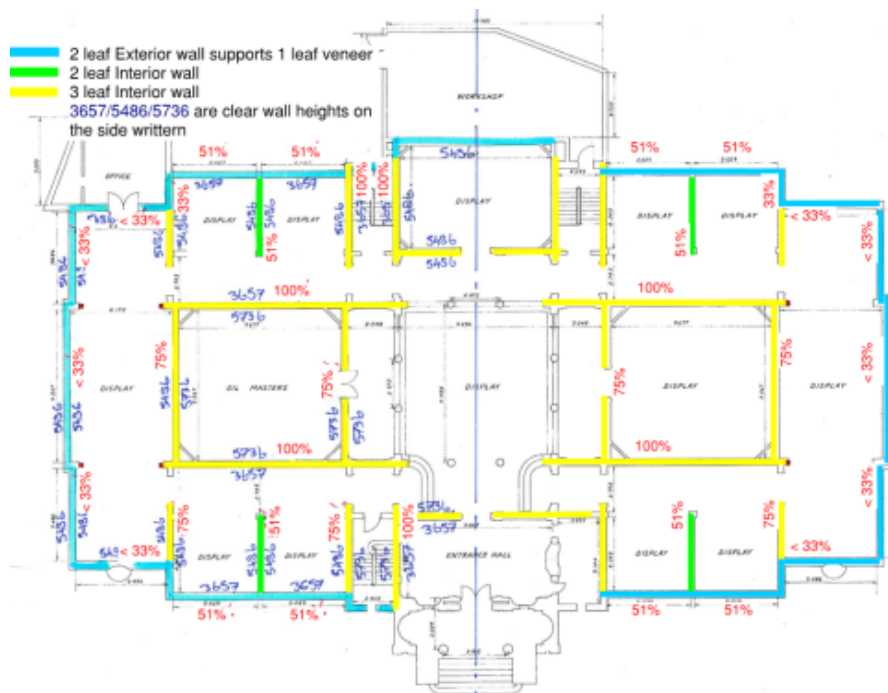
Summary plan of wall out-of-plane seismic capacity %NBS (of IL3). Values below 67% are being considered for out-of-plane seismic strengthening.
